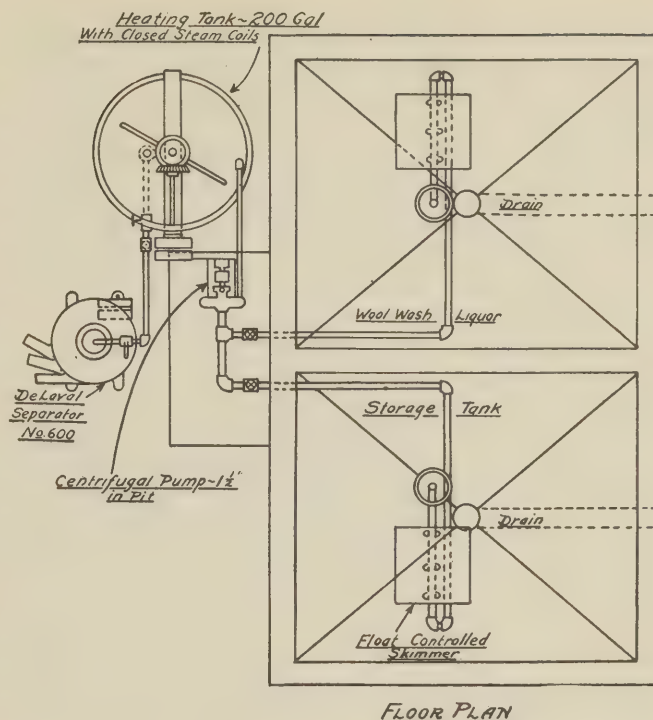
Floor Plan of Wool Grease Recovering Plant
